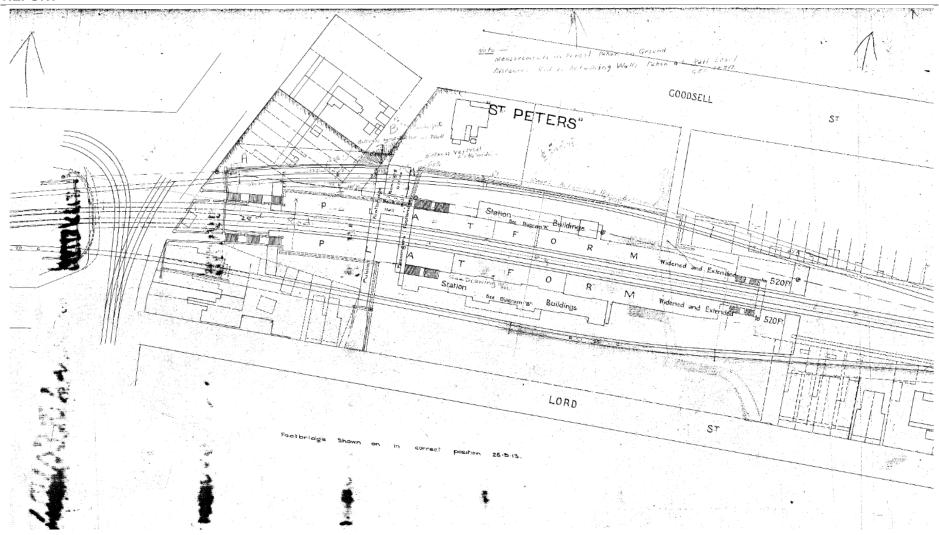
Extract from plan of St Peters Station showing station access, Booking Office, Booking Hall and Station Buildings (annotations dated 1913 and 1917) (Transport for NSW)
